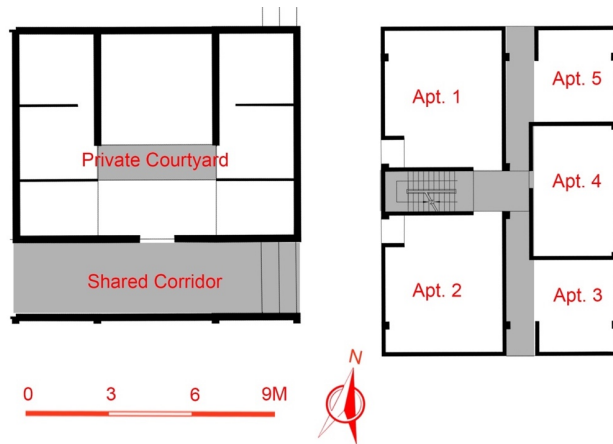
Left*, floor plan of a traditional “three-room-two-corridor” domestic dwelling in the Nantou Village; *right*, floor plan of a newly built “rural” dwelling on the 80-square-meter homestead in the Shuiwei Village
